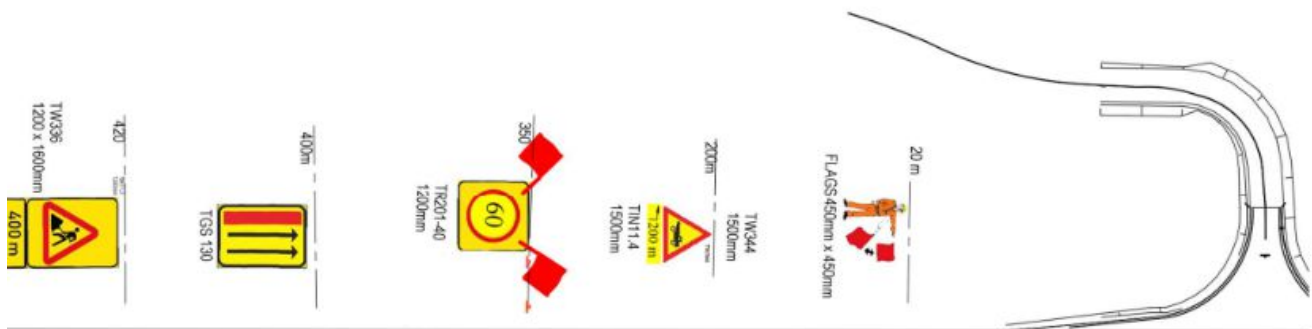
Typical construction signs to be implemented on both sides of the R40/Casteel Dam access intersection.
